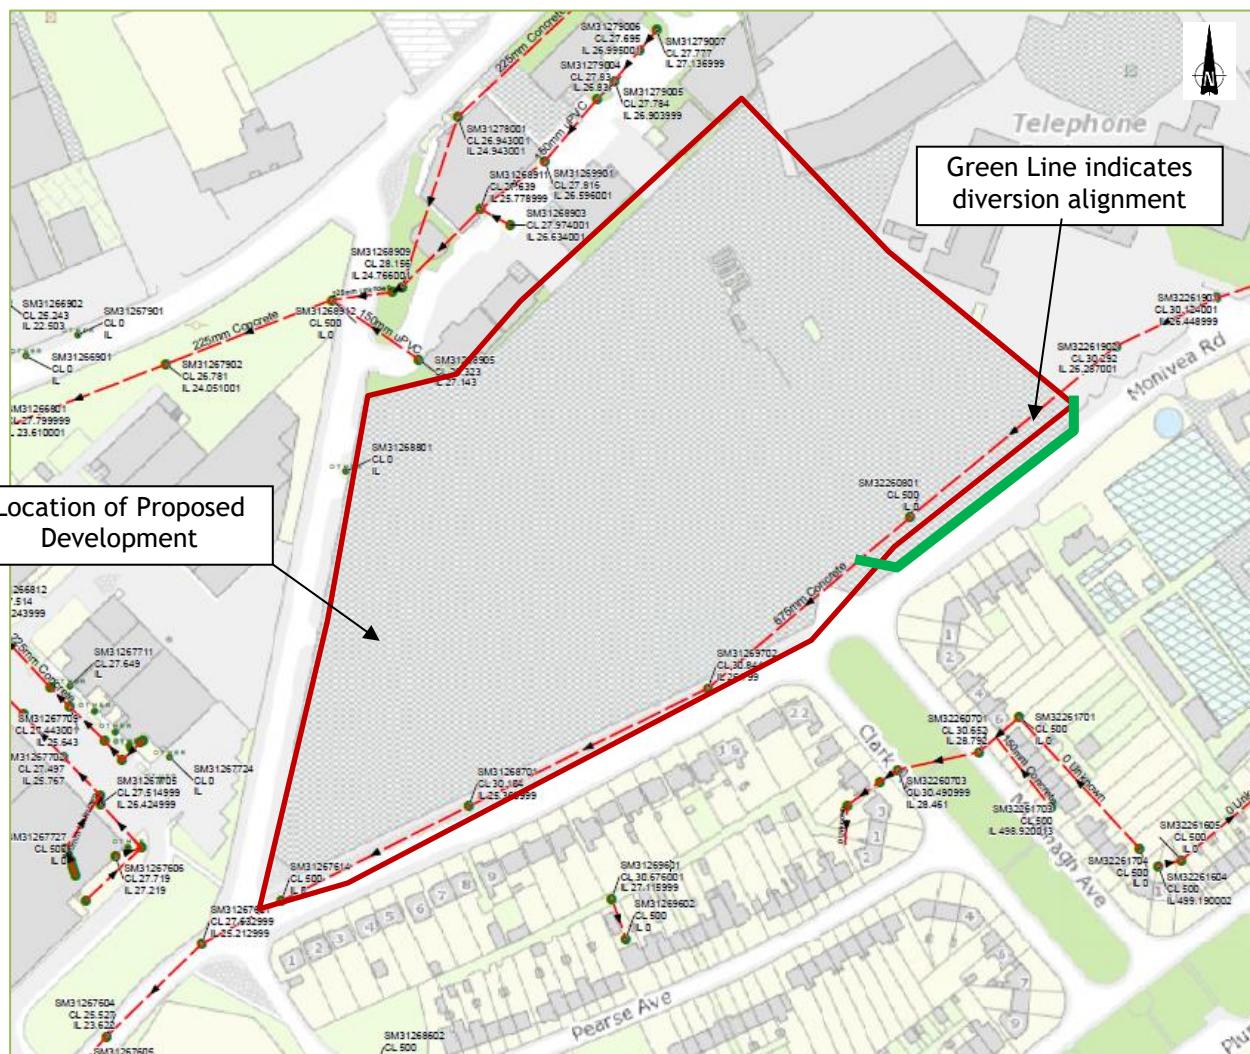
Existing Foul Drainage Surrounding Site (Source: Irish Water Record Drawing)
